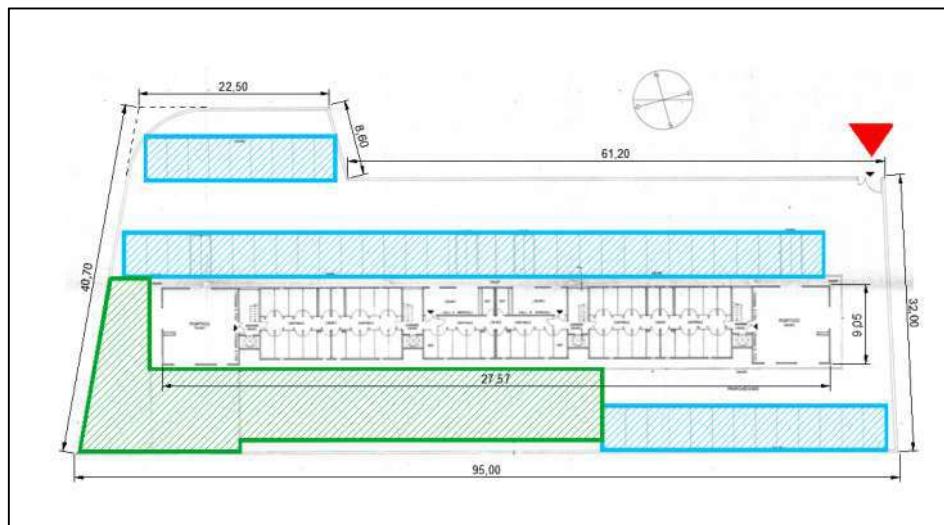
General Plan on which the building site organization is highlighted (the green area, the parking area and the entrance).
